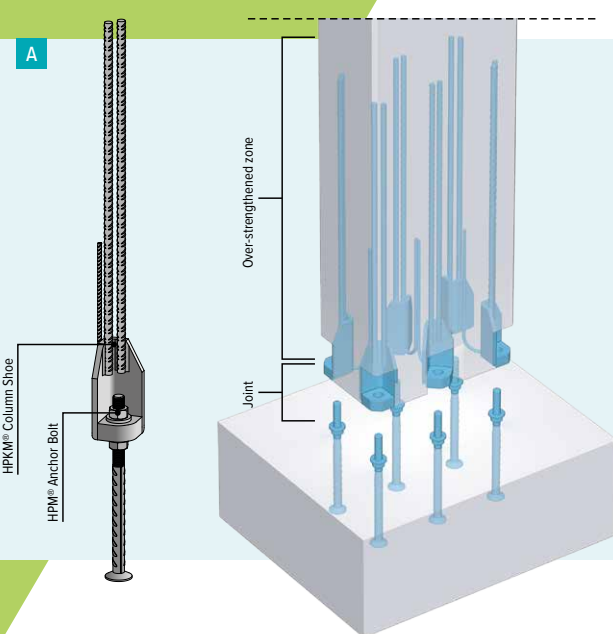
(A) PEIKKO'S BOLTED COLUMN-TO-FOUNDATION CONNECTION (ADAPTED FROM [16], [17])
